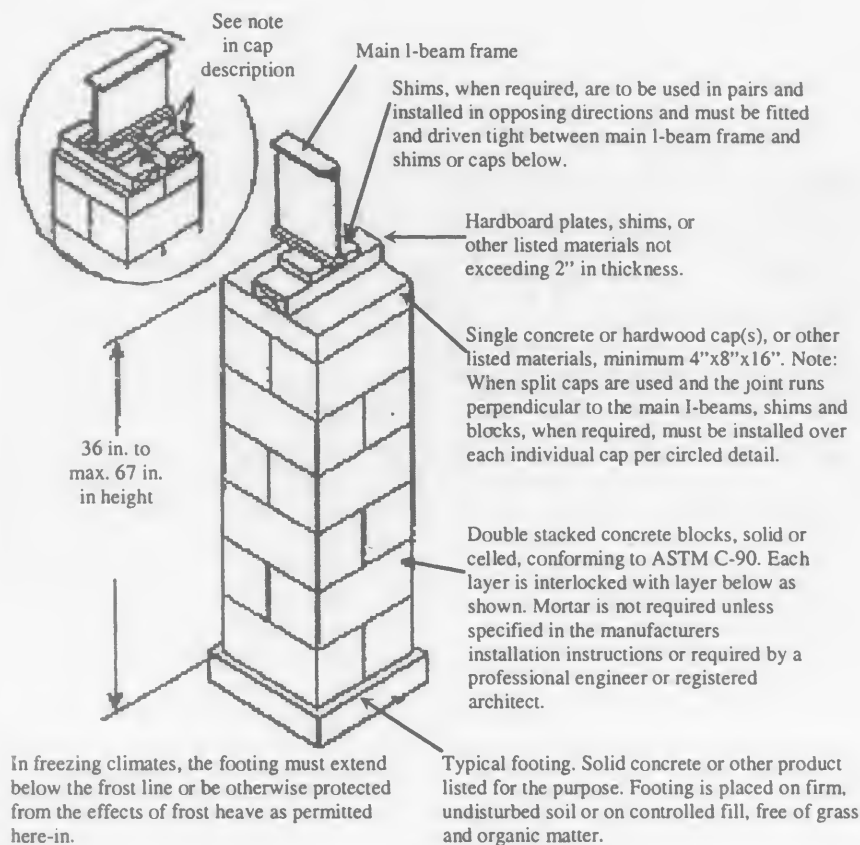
(b) Typical Footing and Pier Installation, Double Concrete Block.§ 3285.307 Perimeter support piers.
